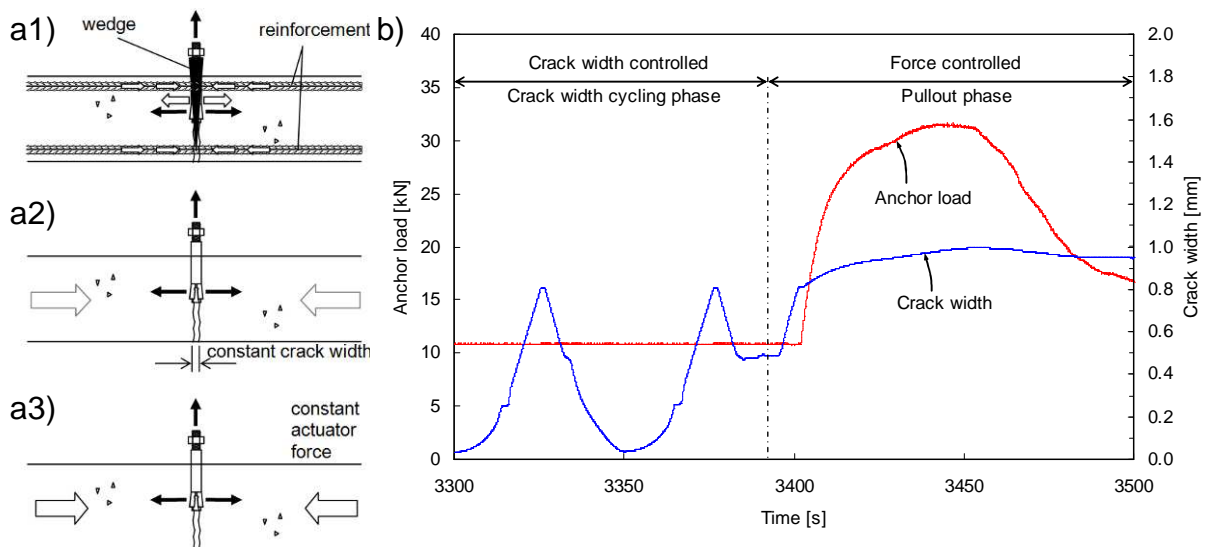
a) Crack opening mechanisms during pullout test; b) Example anchor load and crack width time history illustrating crack opening in case of force controlled actuator during pullout of anchor
